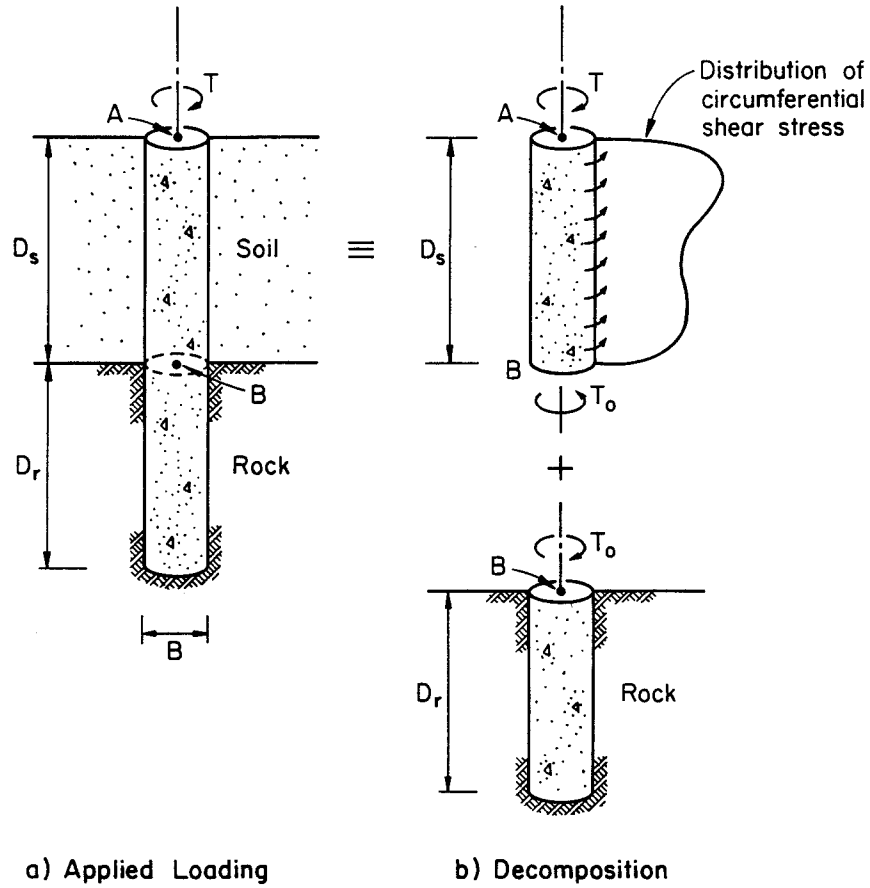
Rock Socketed Shaft under Torsional Loading with Overlying Soil Layer
